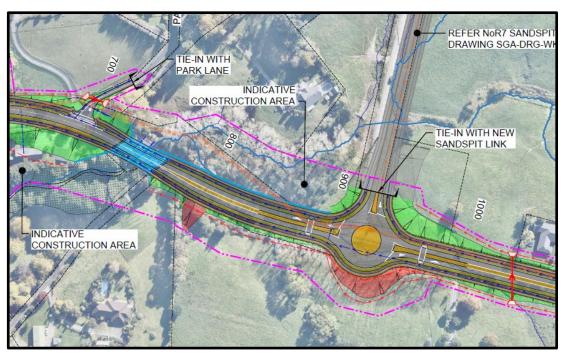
Snip of General Arrangement Plan provided with the NoR application
